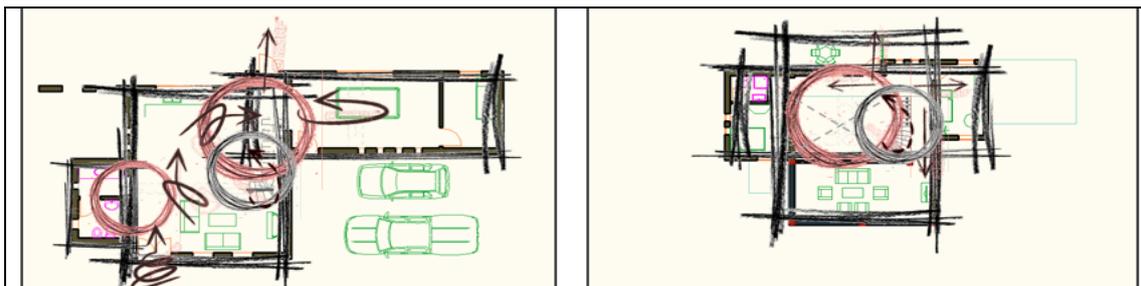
Ground and first floor plan analysis for the second modification (Source: Author).
